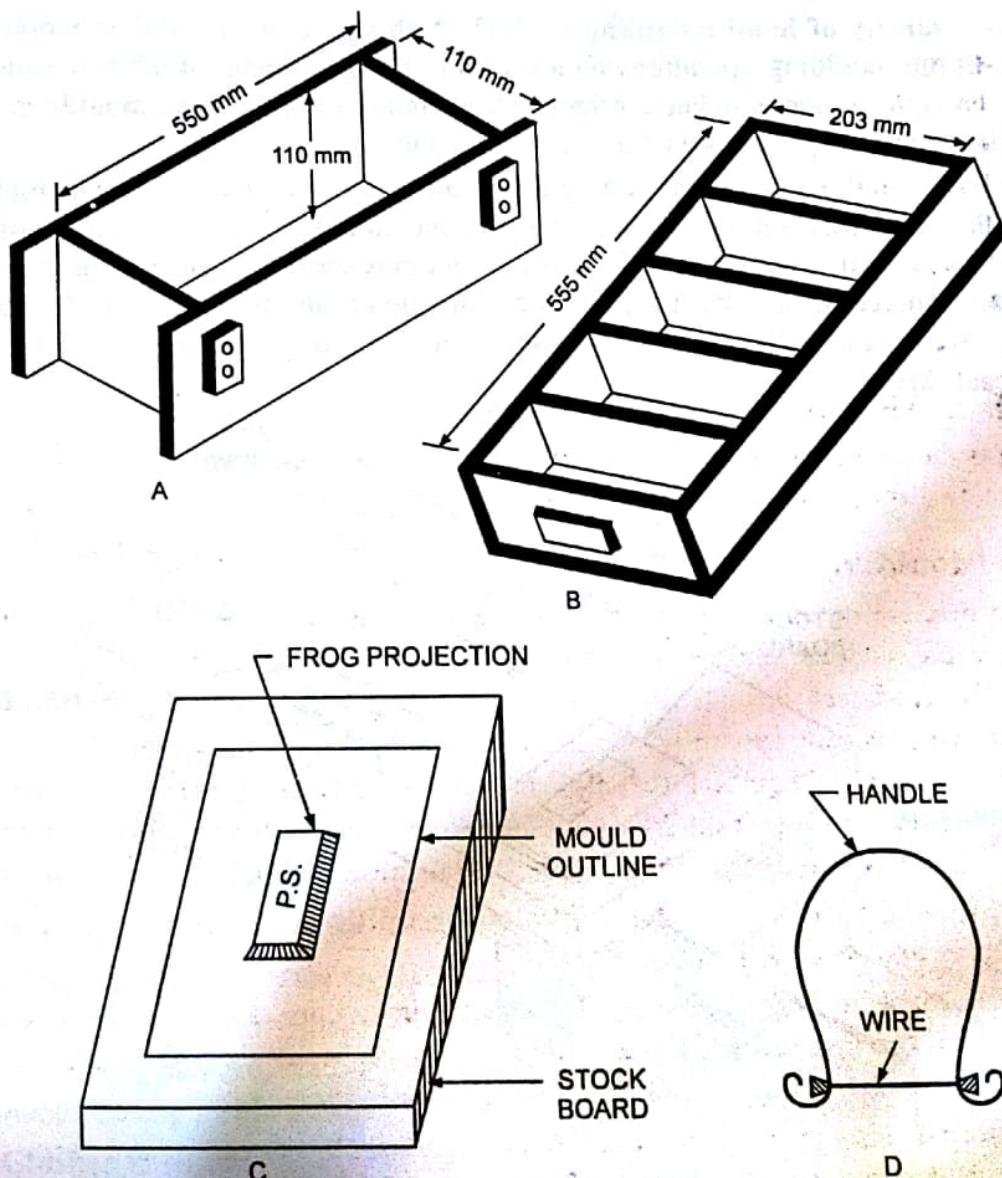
A. Single Brick Mould; B. Multiple Brick Mould; C. Stock Board with Frog; D. Cutting Wire
